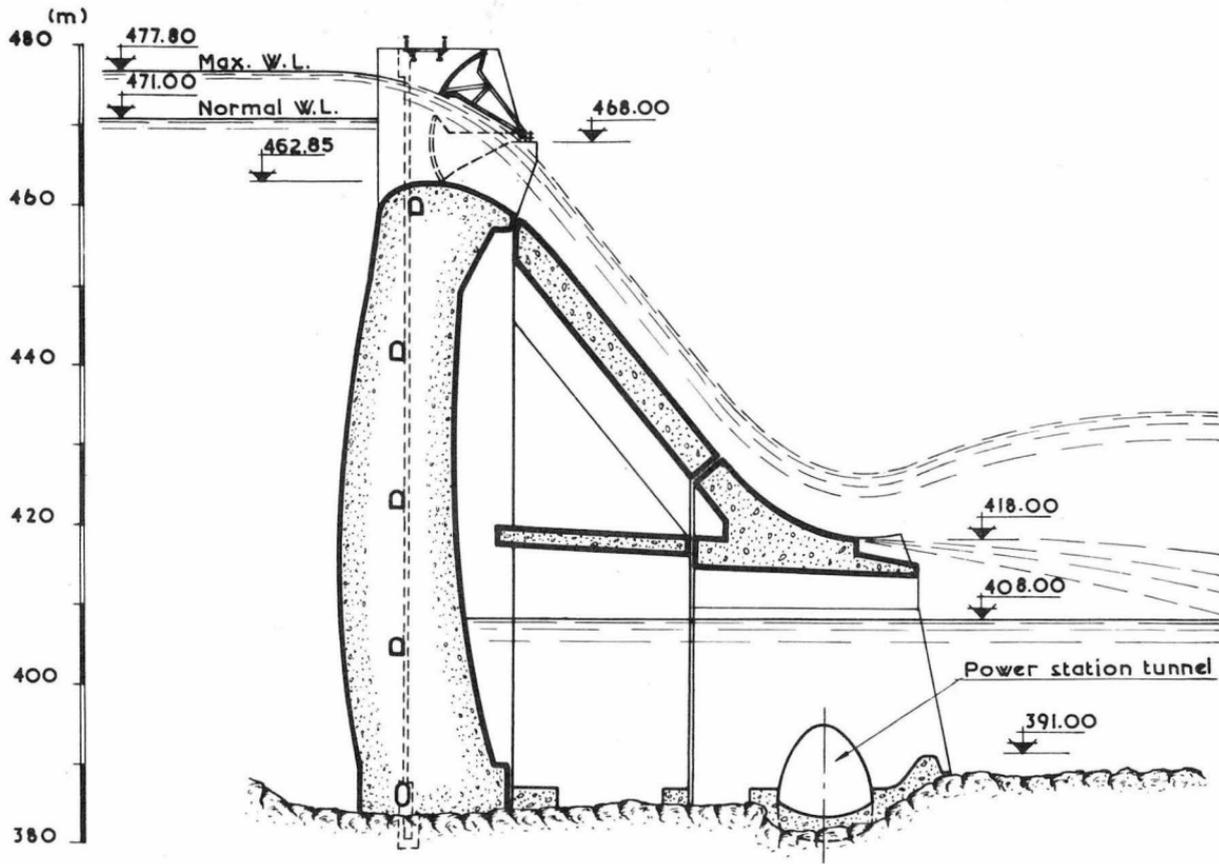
PICOTE — CENTRAL PROFILE OF THE DAM AND SPILLWAY
